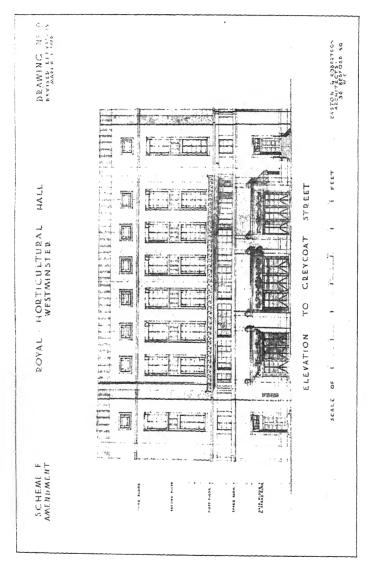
The Proposed New Hall. The Greycoat Street Elevation.
